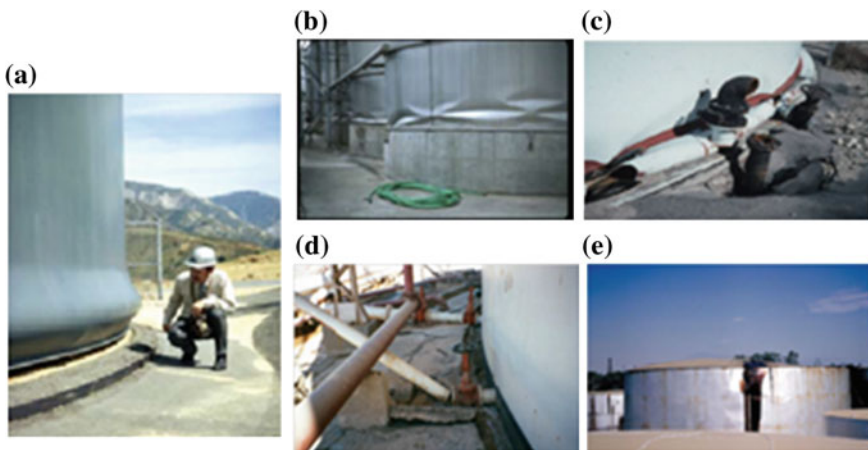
Damages to liquid storage tanks, a elephant foot buckling, b diamond shape buckling, c pipe inlet-outlet breaking, d base sliding, e failure of tank roof (Photo courtesy University of California, Berkeley, [4])
